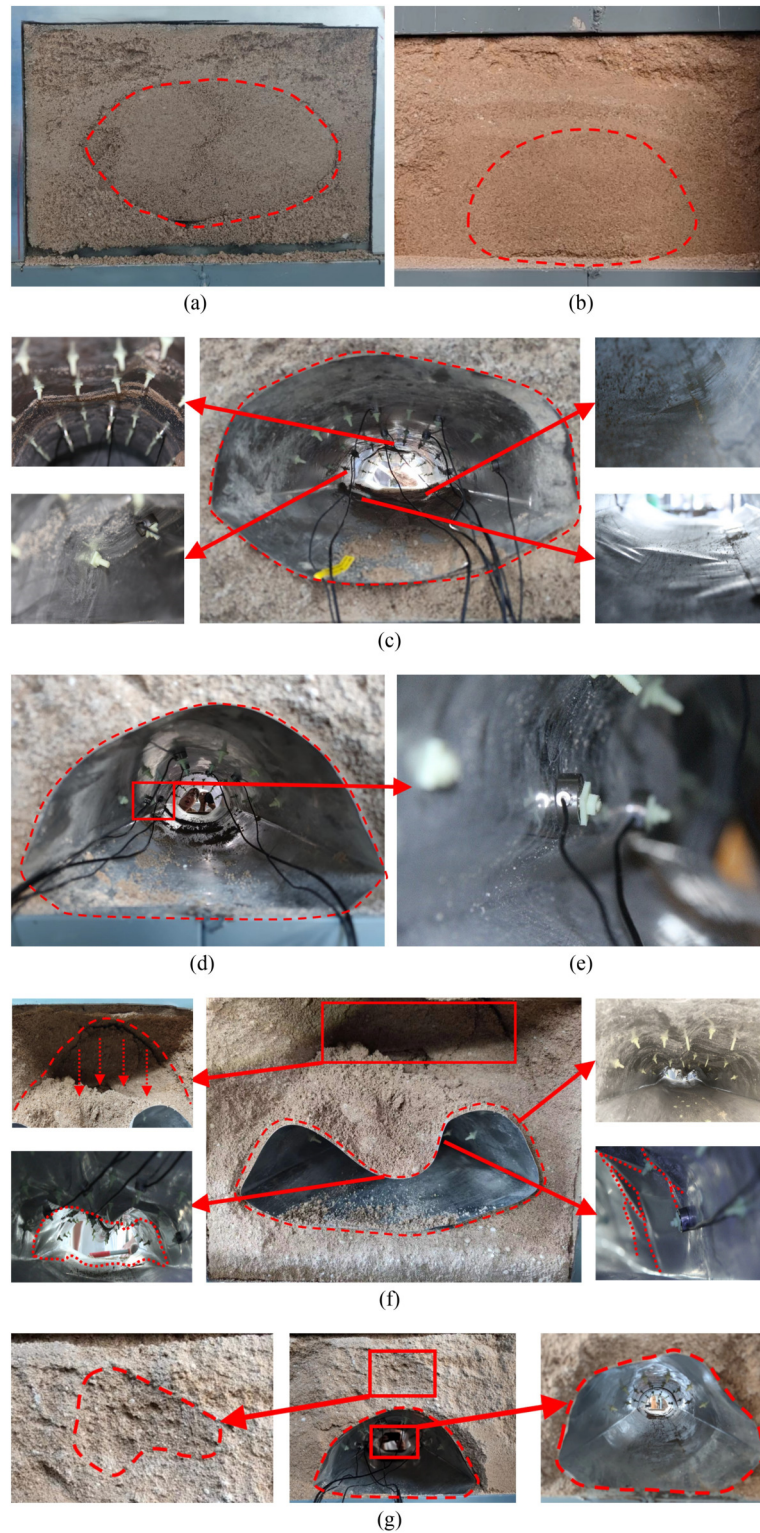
Deformation process of the surrounding rock in the excavation stage: (a) upper tunnel Stage A; (b) lower tunnel Stage A; (c) upper tunnel Stage B; (d) lower tunnel Stage B; (e) tendency of arch rib contraction; (f) upper tunnel Stage C; (g) lower tunnel Stage C.
